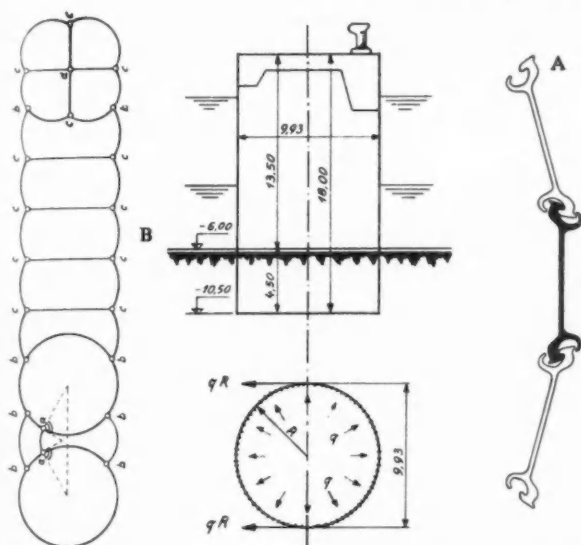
(a and b). Cellular construction in flat steel sheet piling.
